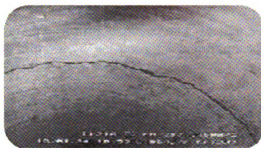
Transverse Cracks in a Culvert Pipe
